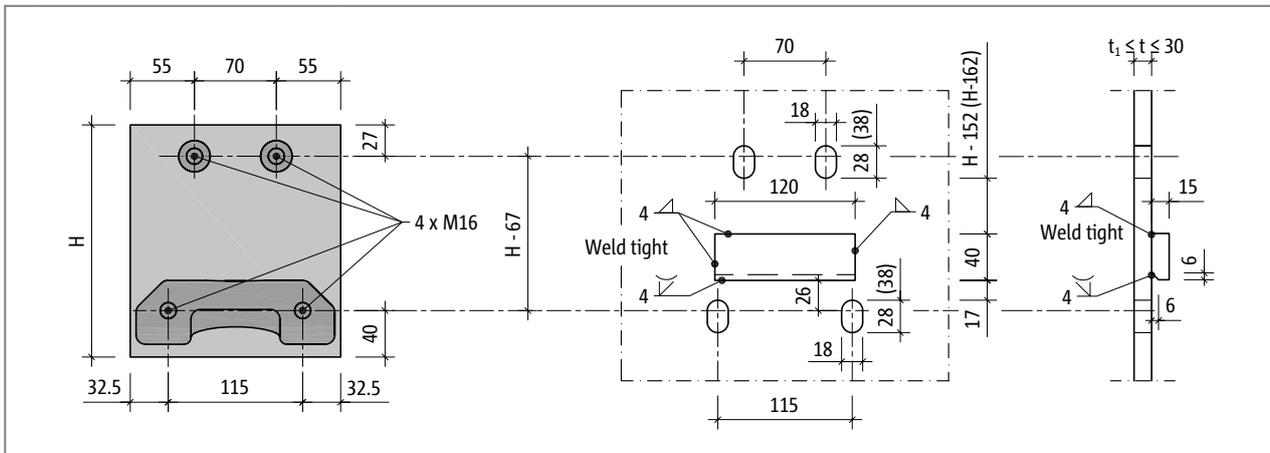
Schöck Isokorb® T type SK-M1: Design of the fixing plate connection
